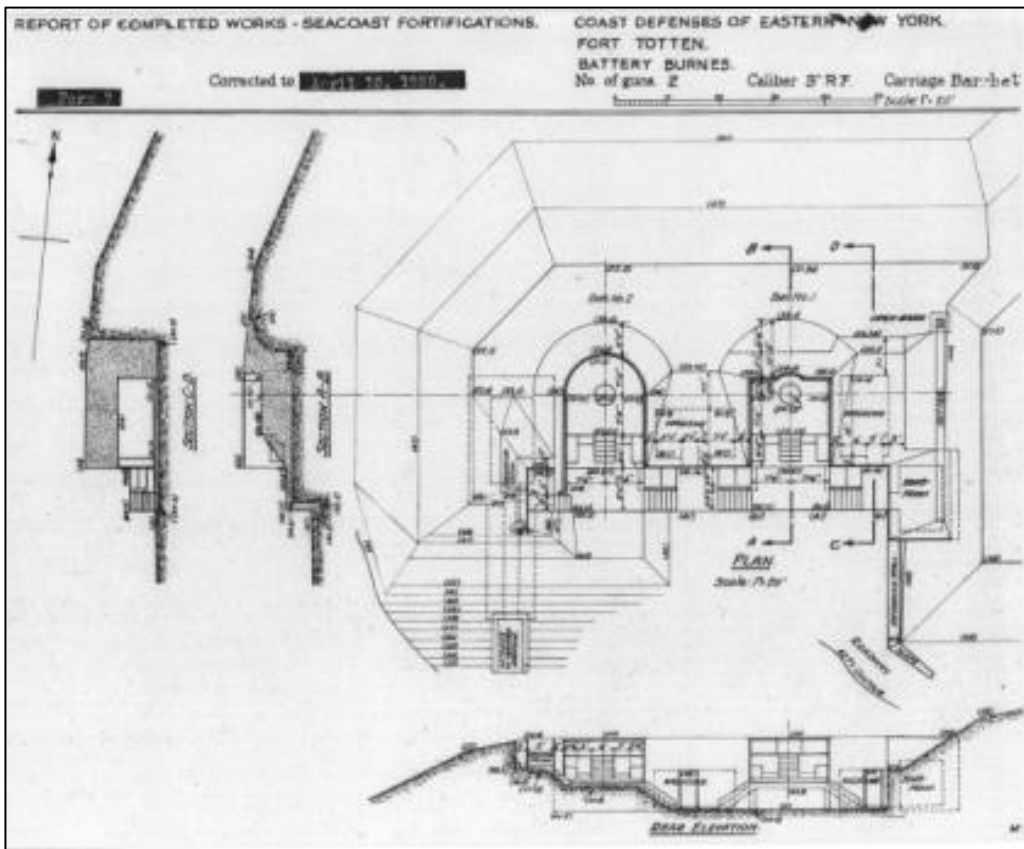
Plan and Sections of Battery Burnes, built 1903-1904 (NARA, 1920, Report of Completed Works)
